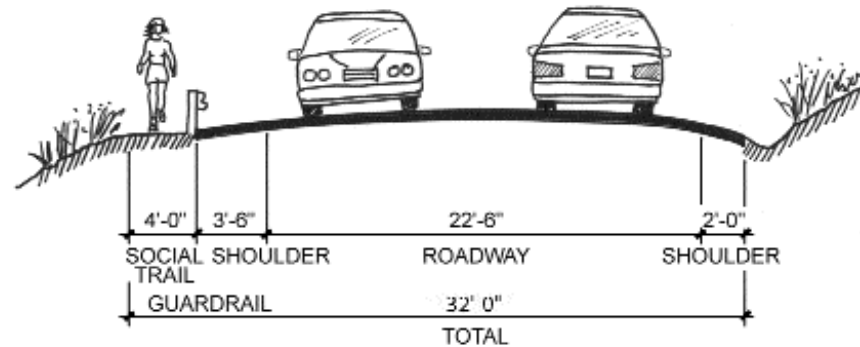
Existing Lincoln Boulevard at Washington Boulevard
